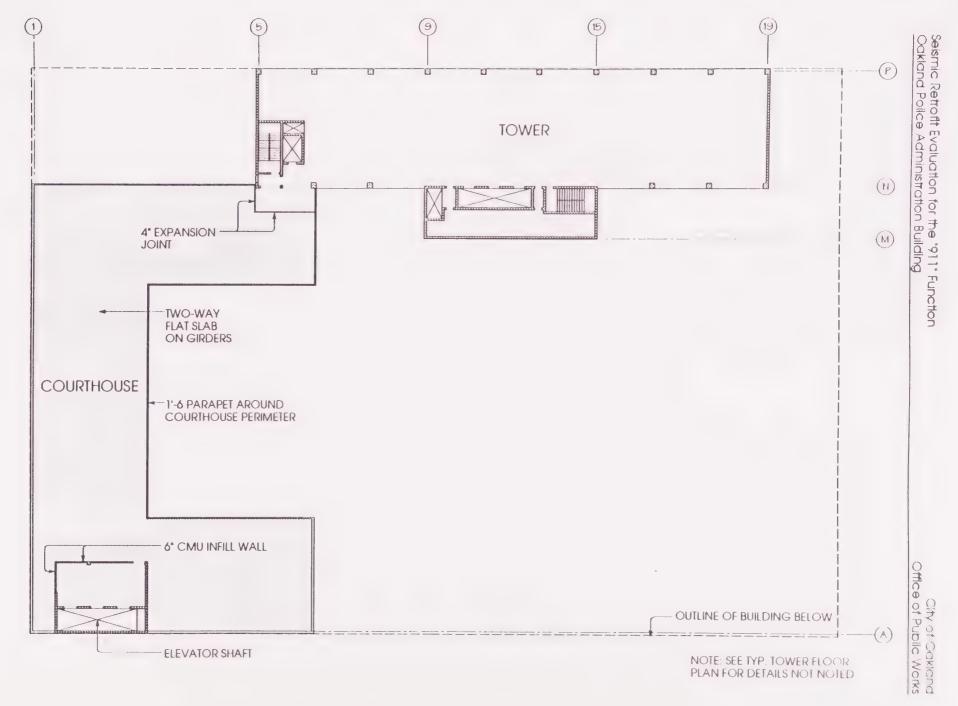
7th Floor / Courthouse Roof Plan 🚳
